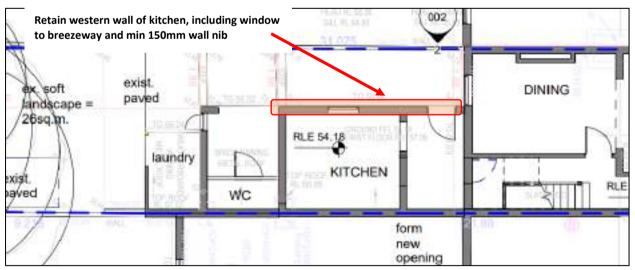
Extract from existing floor plans detailing the extent of the kitchen wall and western window to be retained
